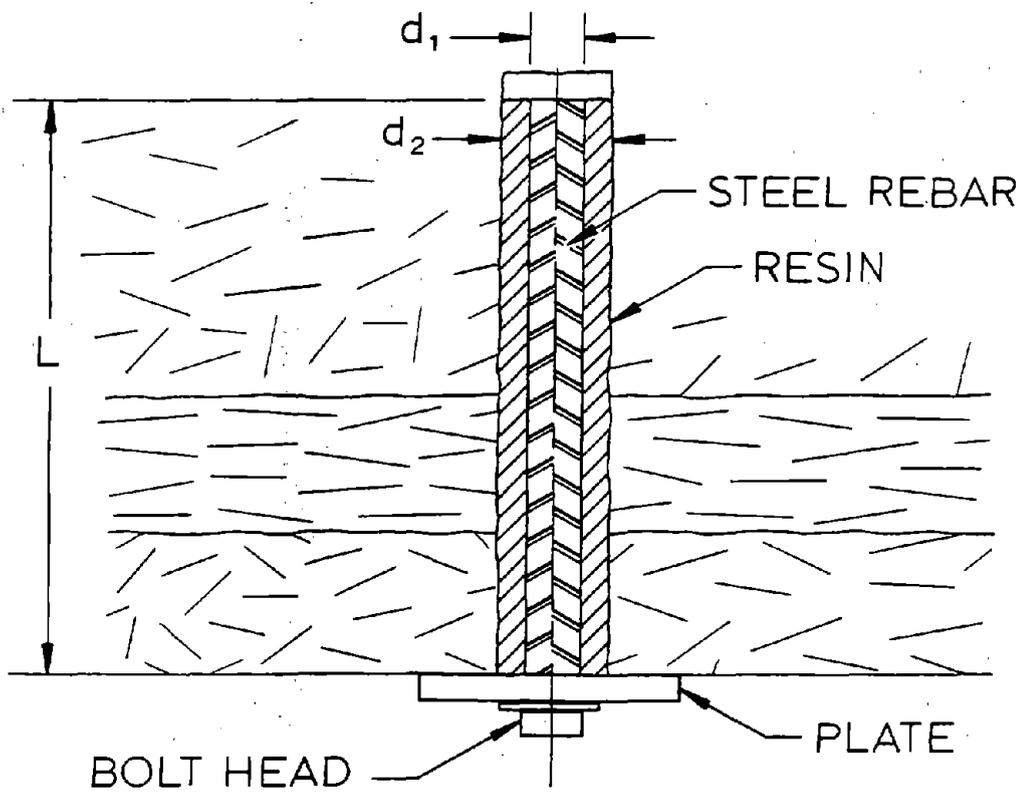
Fully-Grouted Resin-Bonded Bolt
